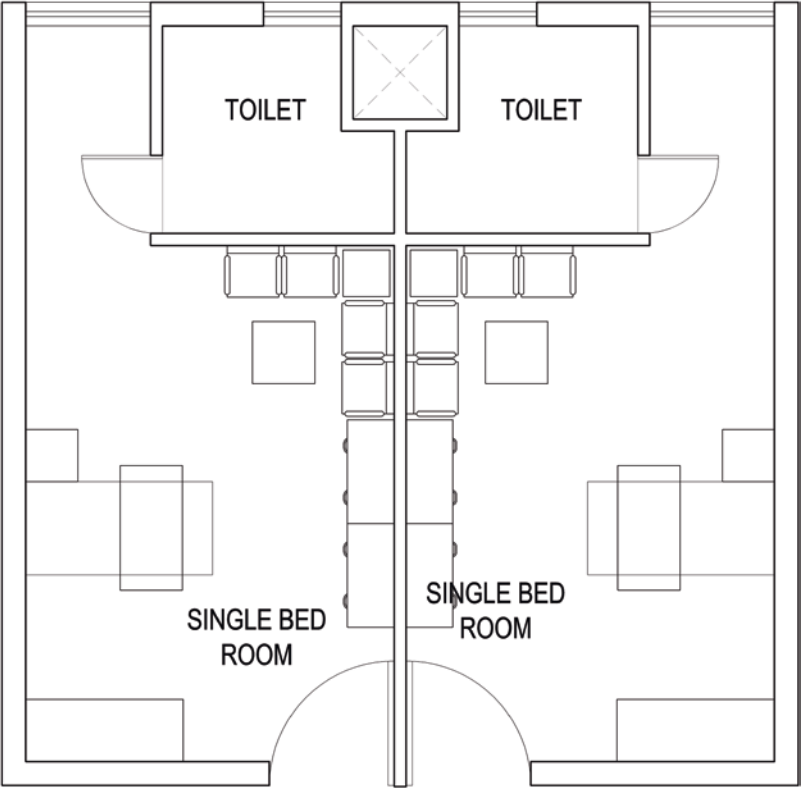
Sample layout drawing of out-board single occupancy room
